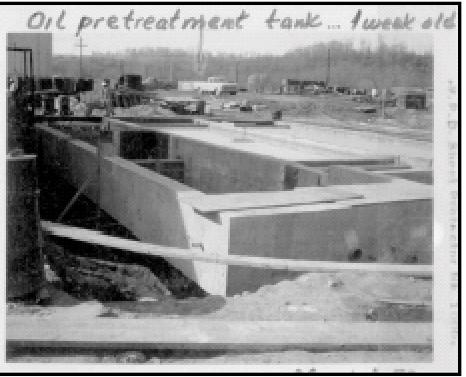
March 1, 1972 photo. View looking west from east side of new EQ tank (inside of south settling tank appears to be asphalt coated).
